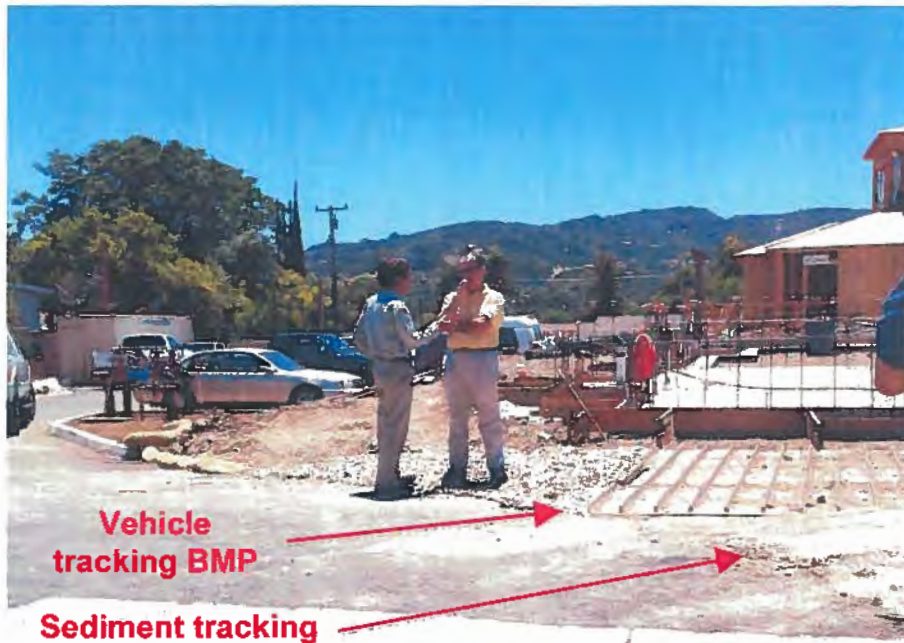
Many Mansions Site Visit – View facing west on Los Feliz Drive of unstablized soil outside the perimeter construction fence.
